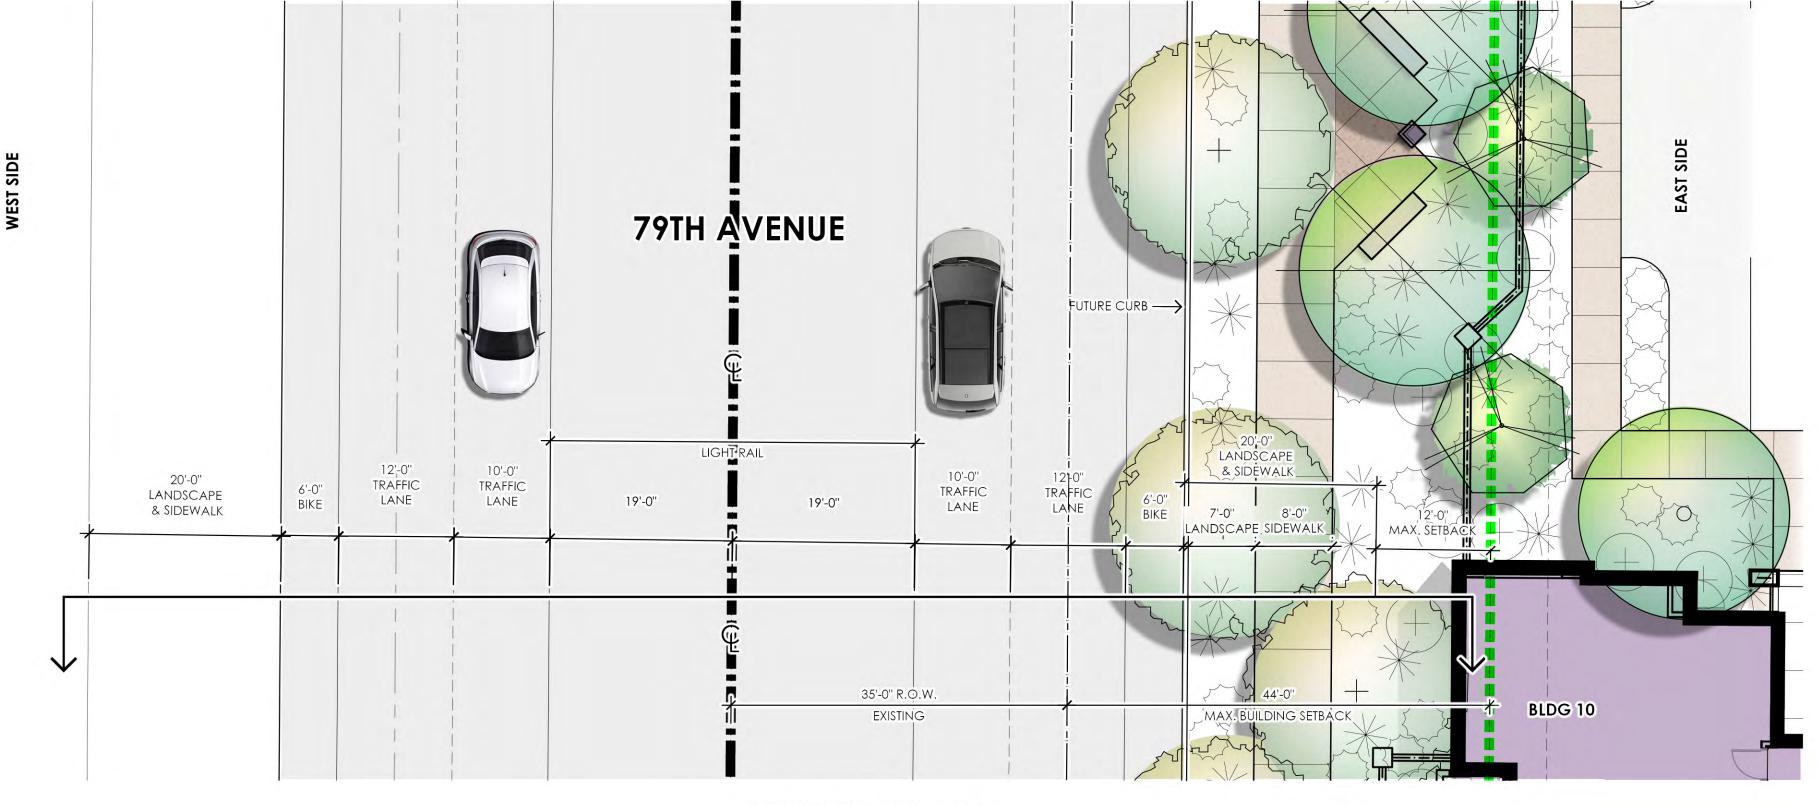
79th Avenue Streetscape, Encanto Boulevard Streetscape, and Shade Calculations
